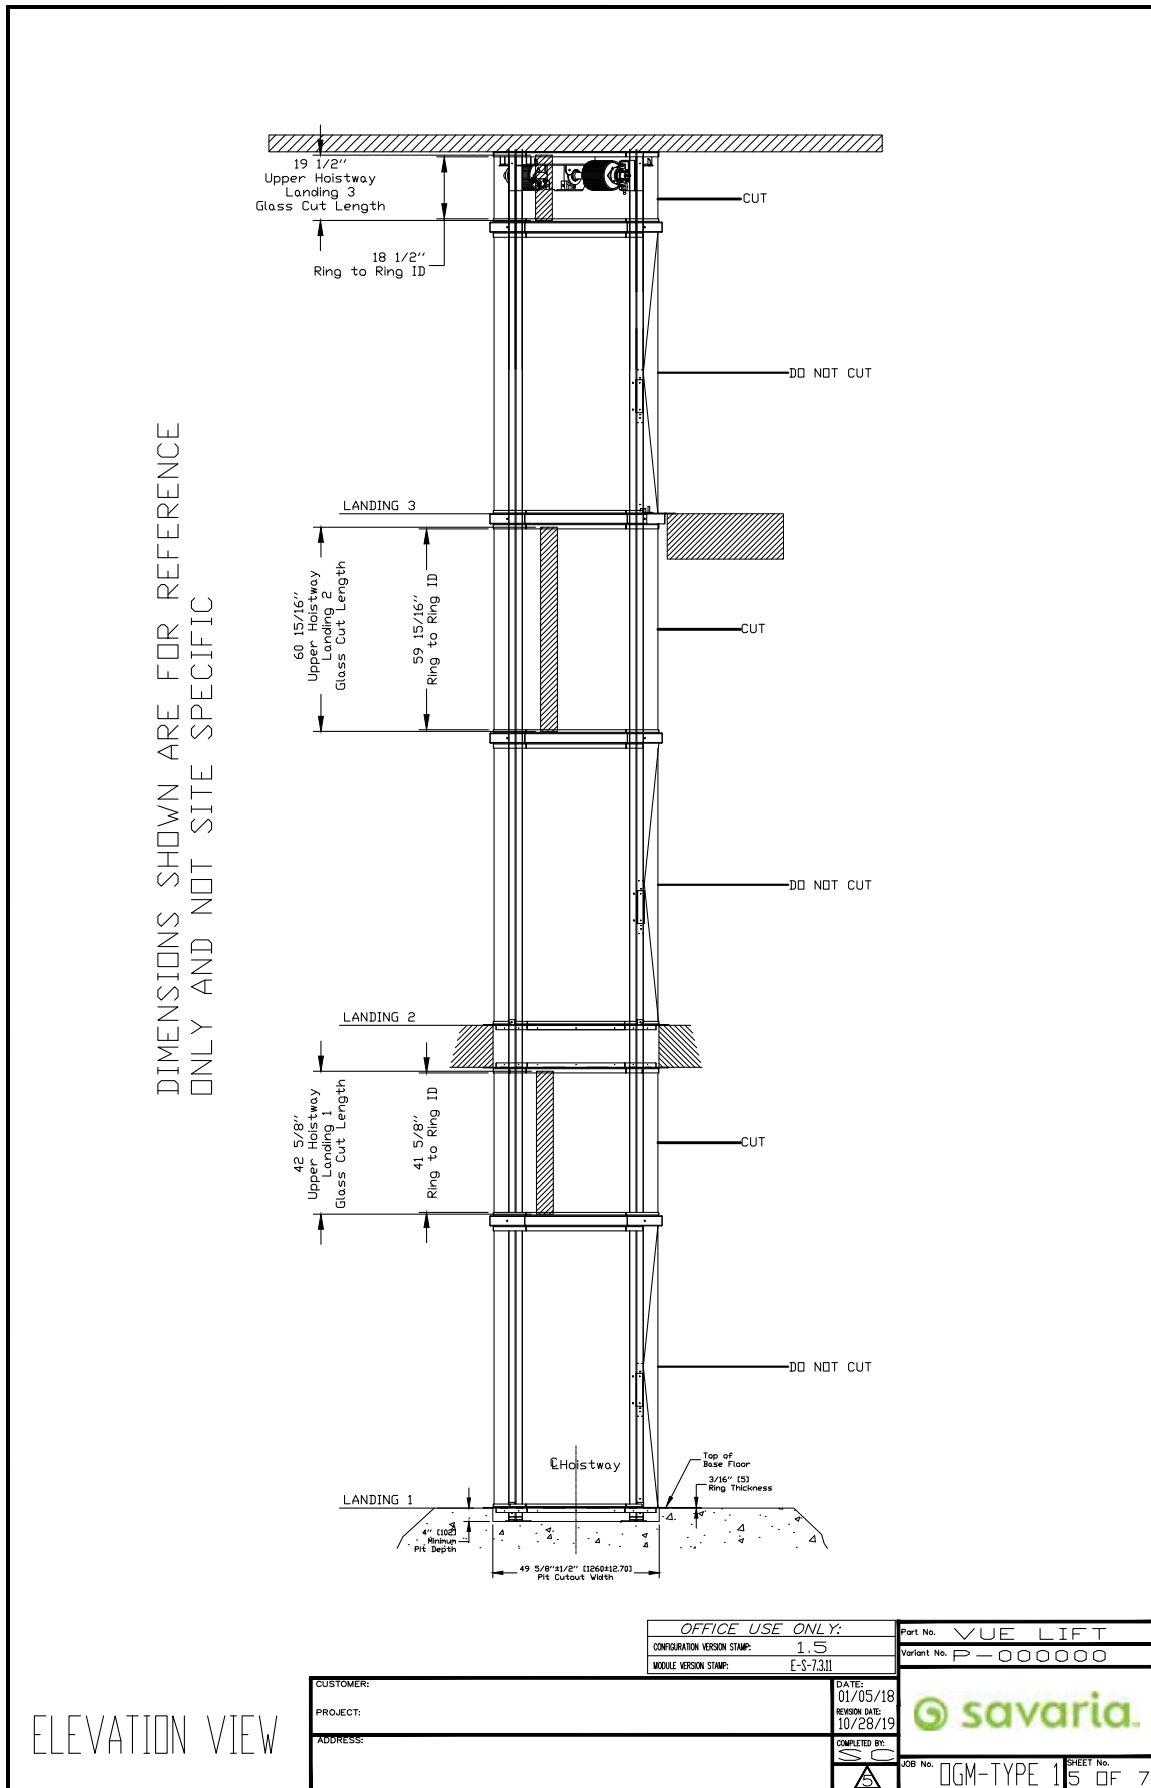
Elevation view (OGM, type 1) - extra header rings if floor-to-floor height &gt; 14 ft
